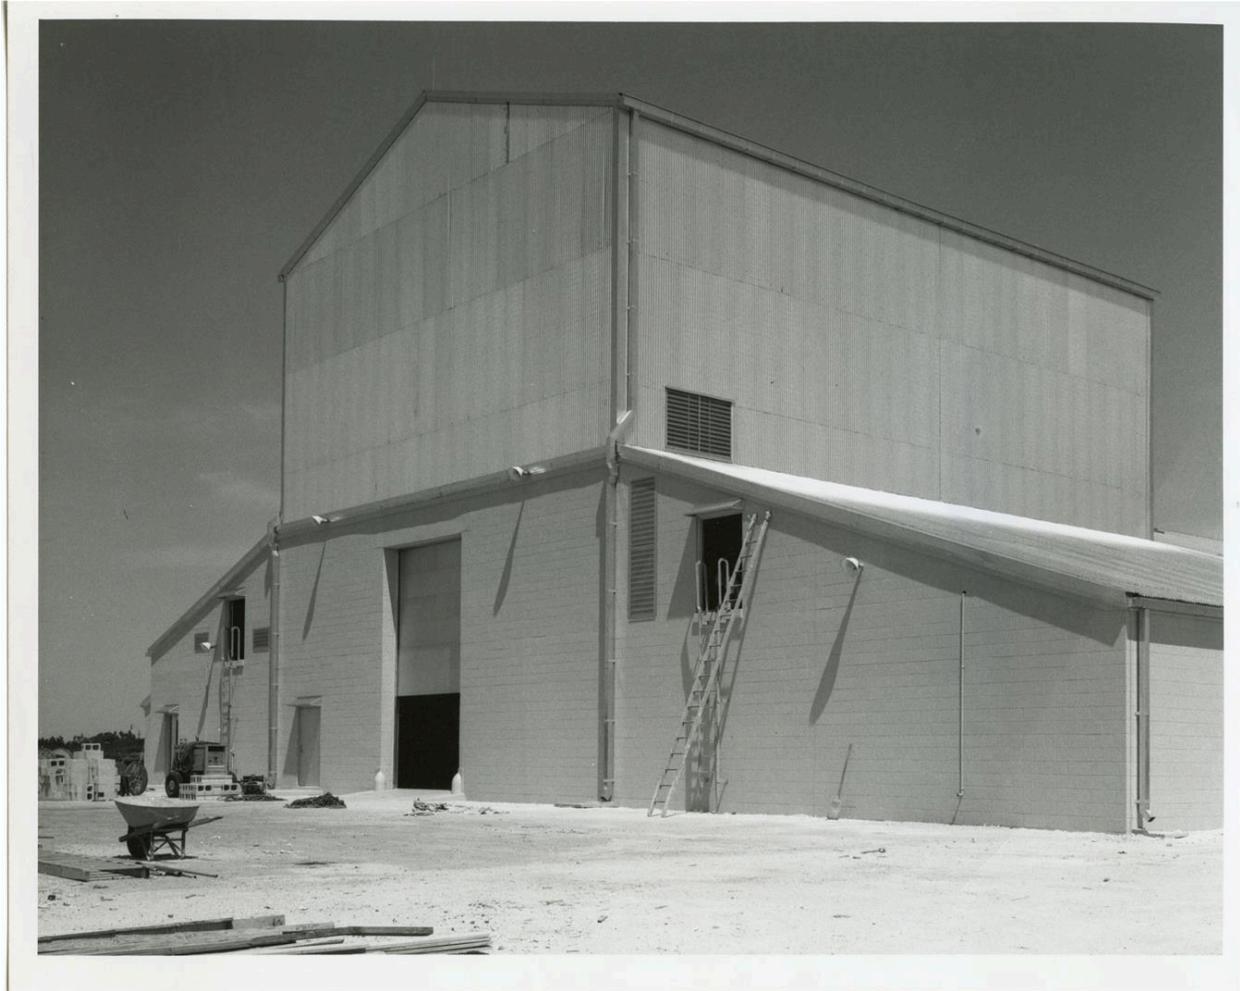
Hangar AE high bay under construction, 1961. (Courtesy of Kennedy Space Center Archives, Image LOD-61-4343).
